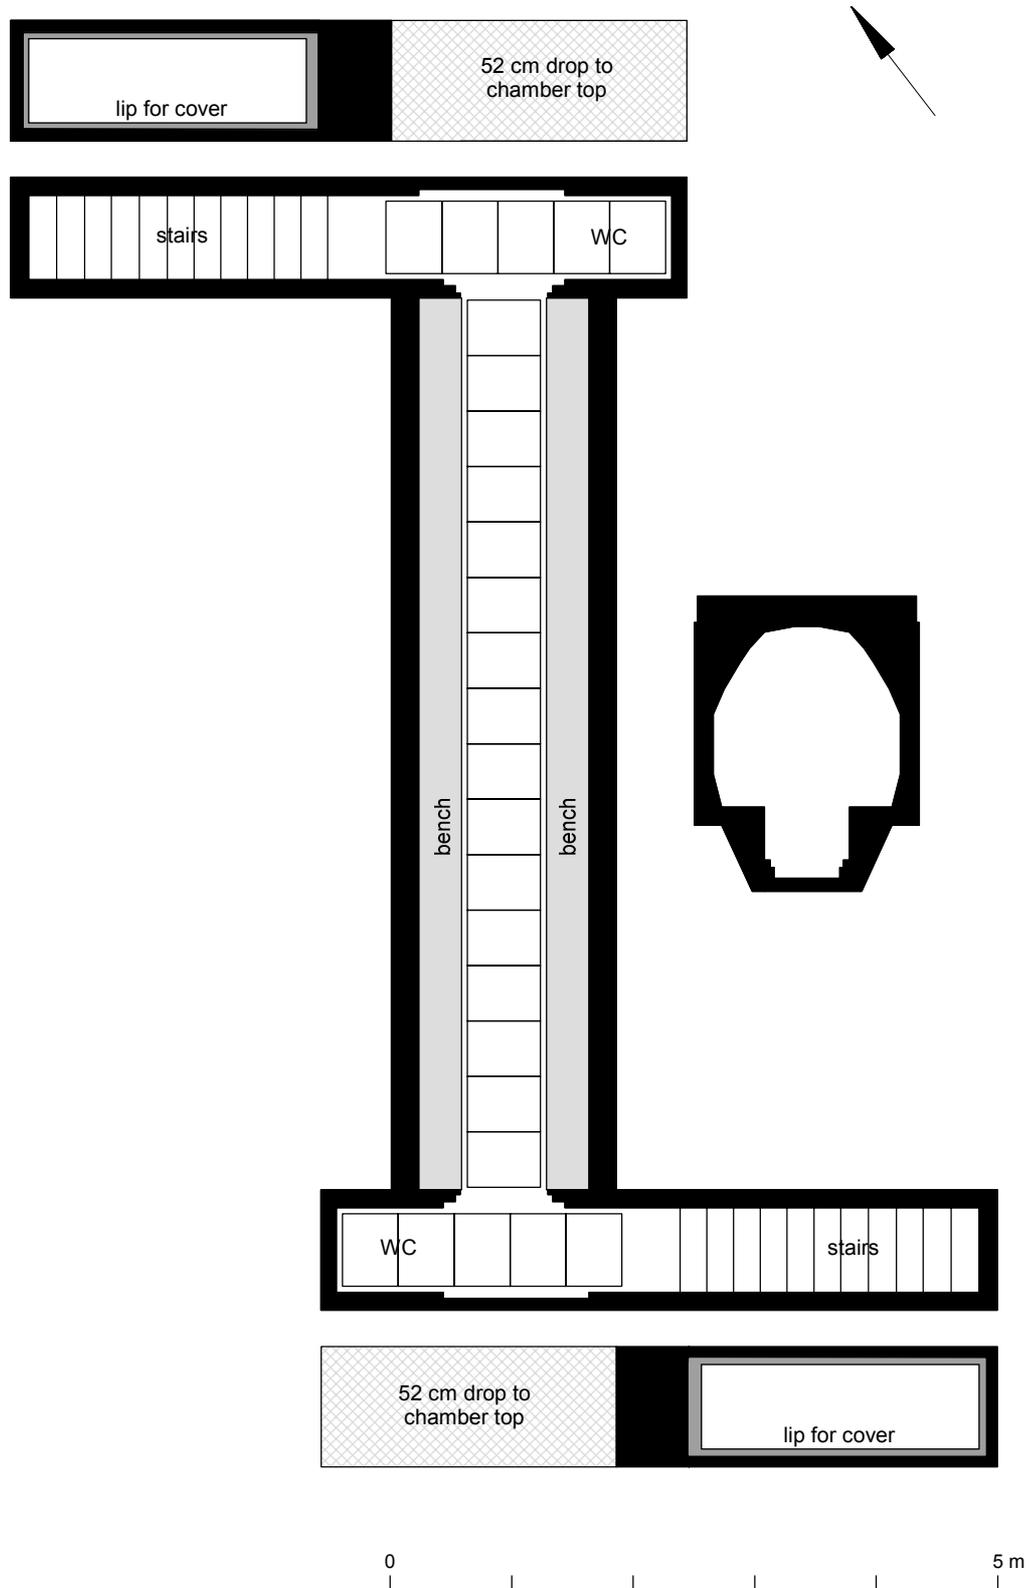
Area J1, air-raid shelter F1: internal plan and cross-section of chamber.
